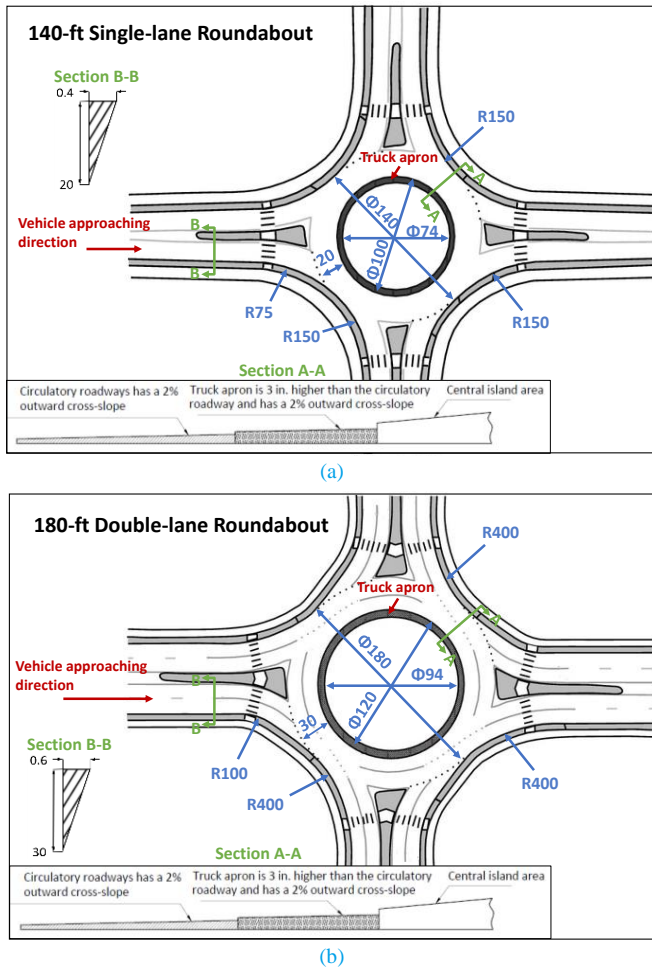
Horizontal geometry of (a) 140-ft single-lane and (b) 180-ft double-lane roundabout models
